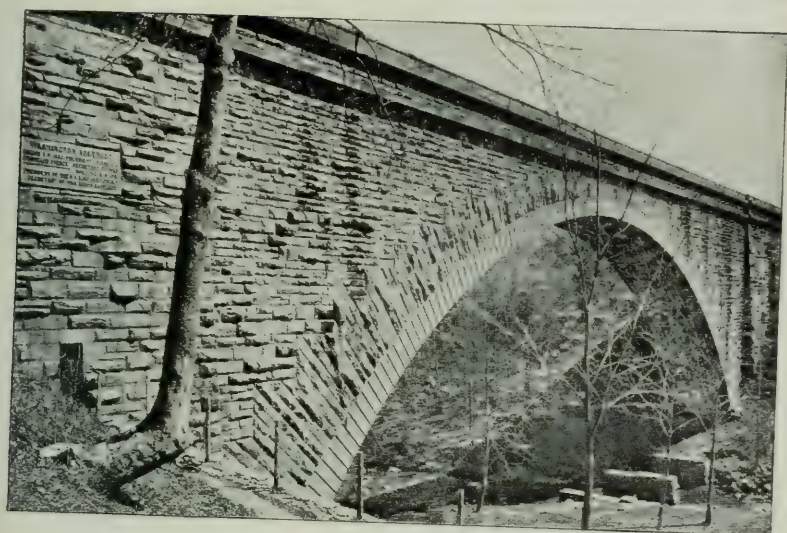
The Cabin John Bridge, Washington, D. C., Aqueduct, longest masonry arch in the world.
